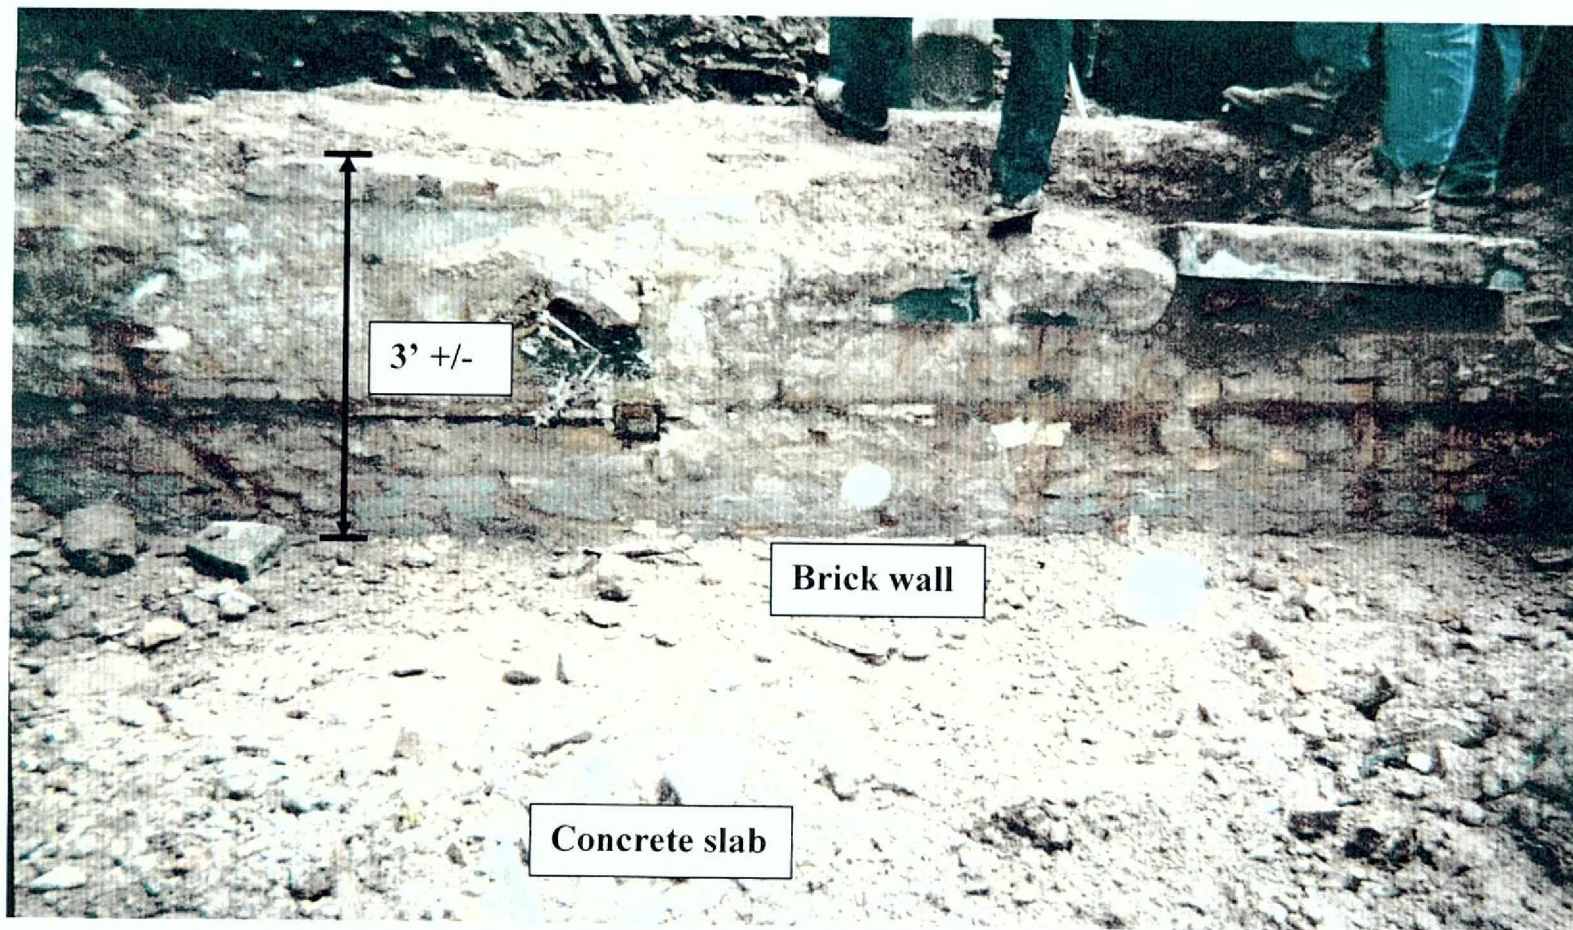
TP-8: Facing North. Corner of 25 & 55 Broad Street.
